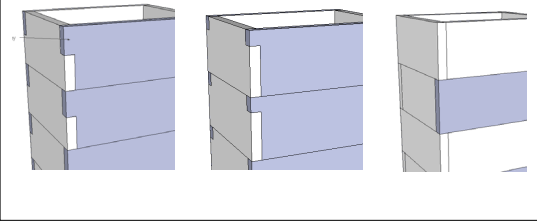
Strijkijzer, Den Haag. Tube structure composed of precast concrete elements
